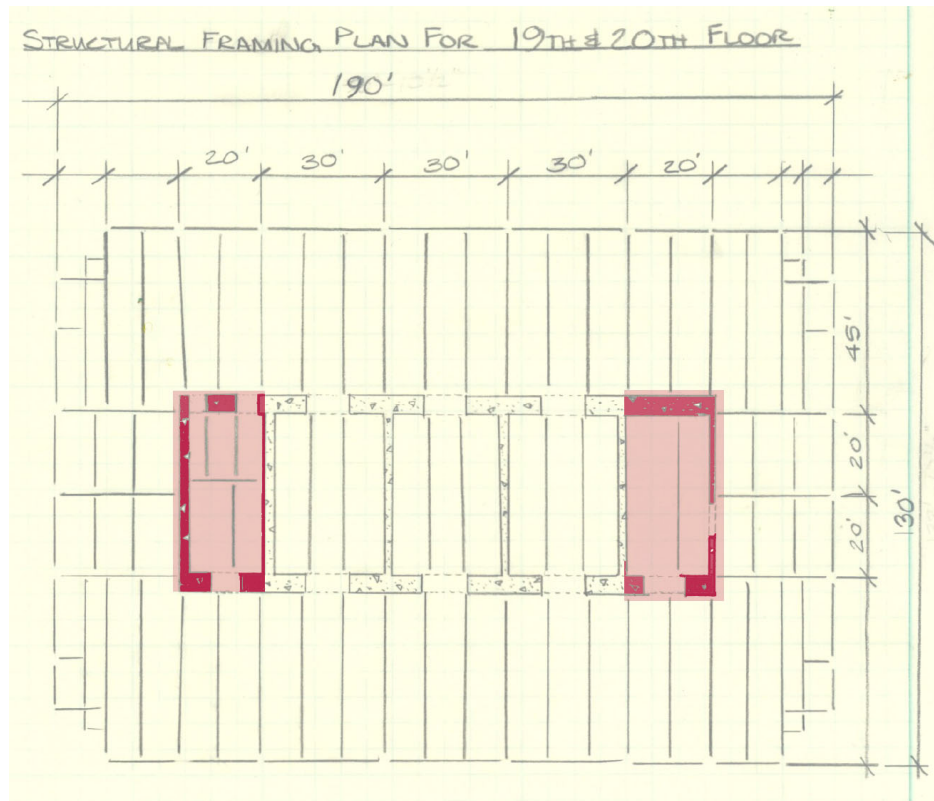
EXISTING 19TH FLOOR PLAN. RED SHADED SHEAR WALLS TO BE REMOVED FROM DESIGN
